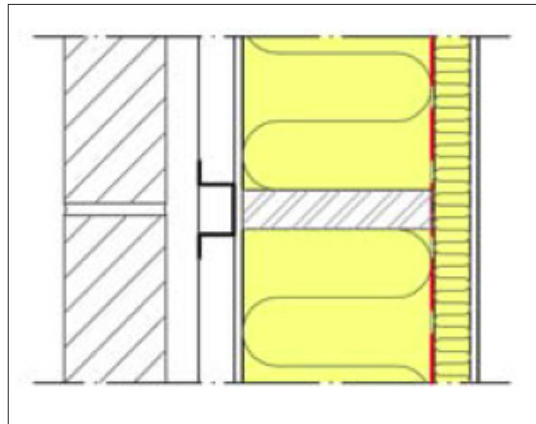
As an outcome of the FRAME project conducted earlier in Finland, it has been proposed that to secure ventilation and to prevent rain water entering the timber frame of a tall brick-lined façade (over 10m), a steel plate should be placed between the timber frame and the brick lining. This is an example of structures that add to the skills requirements of house builders. (Image: Lahdensivu et al. 2012)
